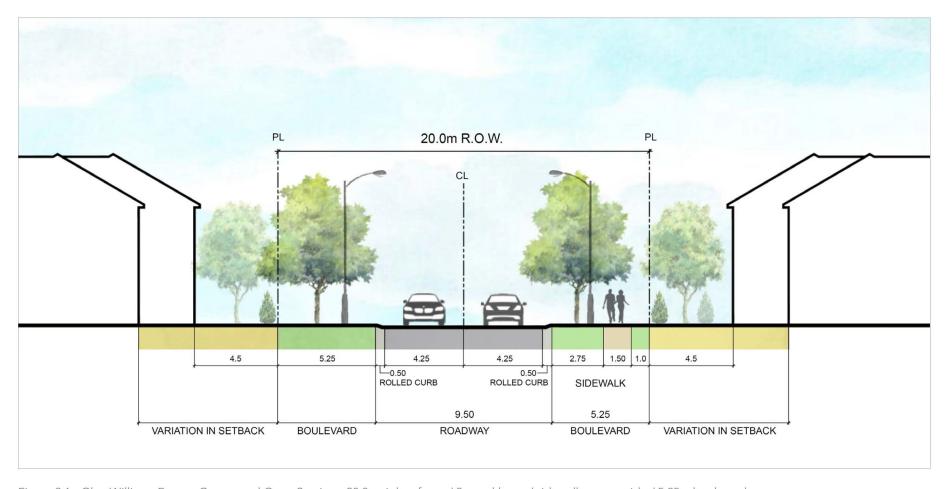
Glen Williams Estates Conceptual Cross Section - 20.0m right-of-way / 2 travel lanes / sidewalk on one side / 5.25m boulevard
